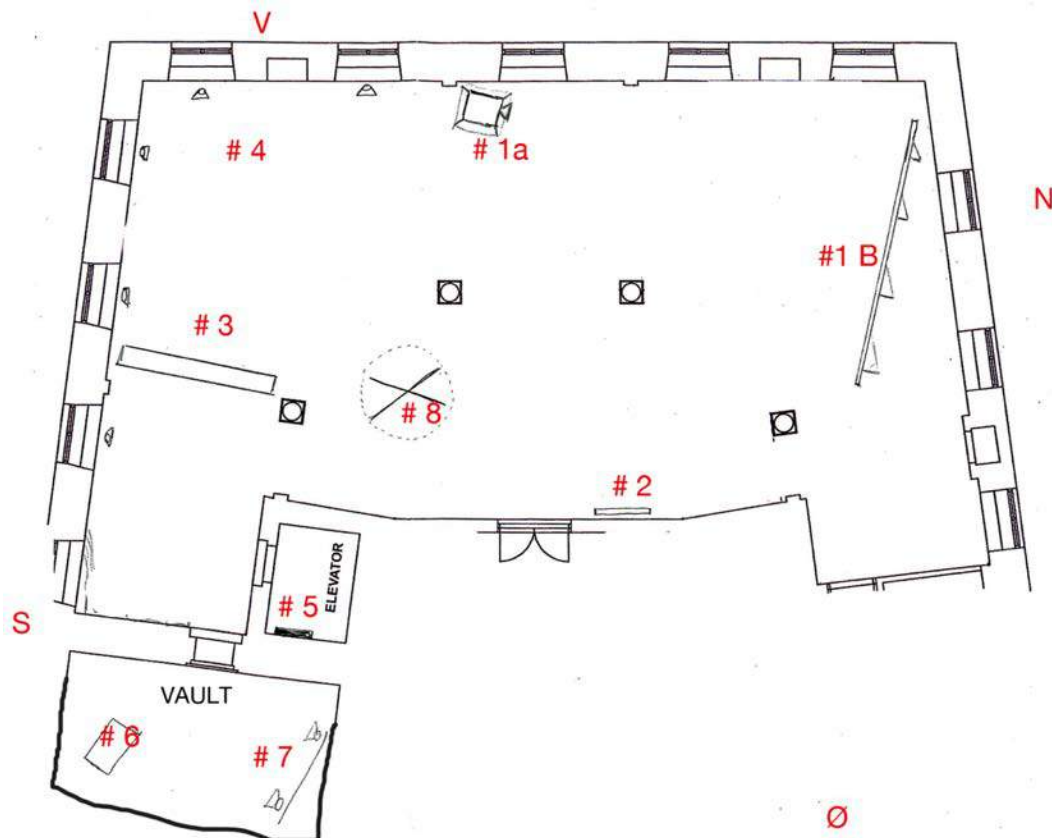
, Floor plan of gallery 3,14 with distribution of works (#1 - #8) and cardinal directions N, S, Ø, V.
